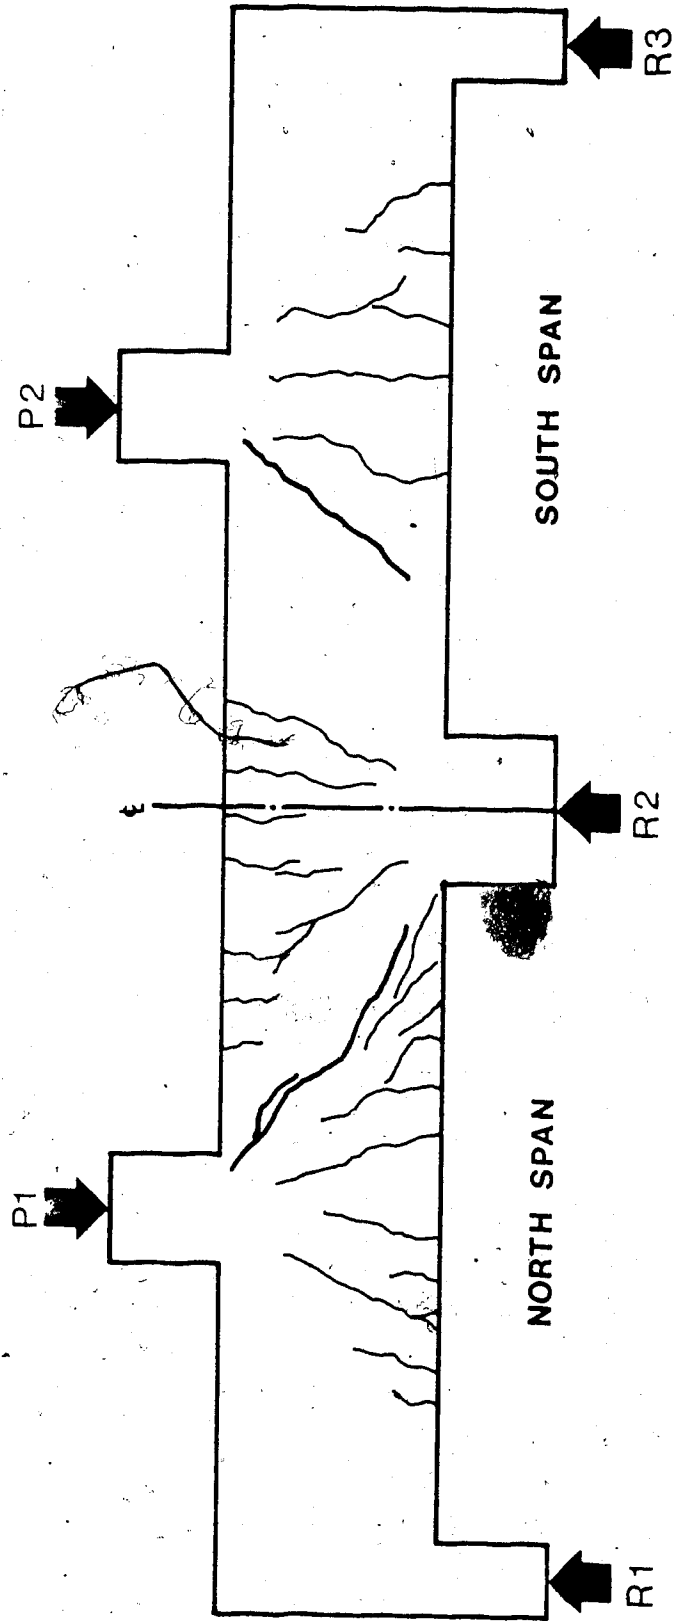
First Inclined Cracking Pattern of Beam No. 3
